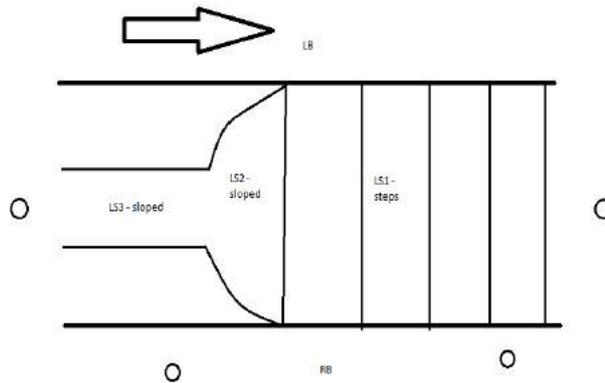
Site plan for Mill Stream Barrier 1
